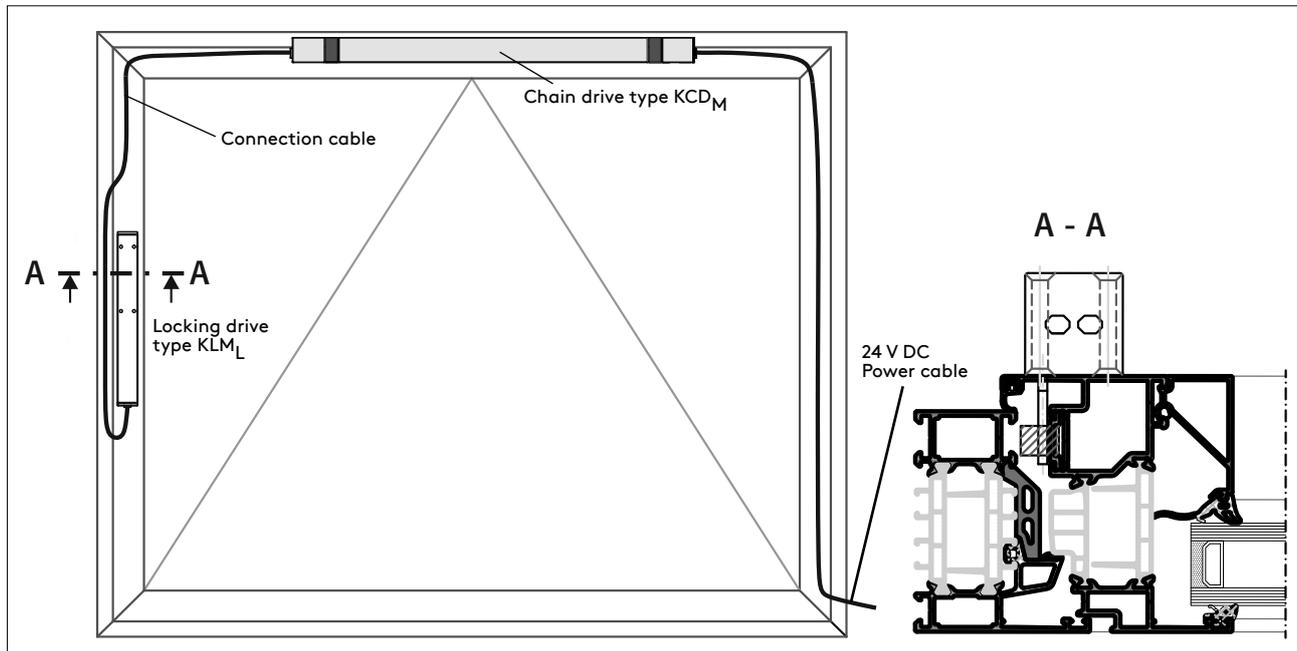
Installation example on inward bottom-hung window with chain drive type  $KCD_M$  and locking drive  $KLM_L$
